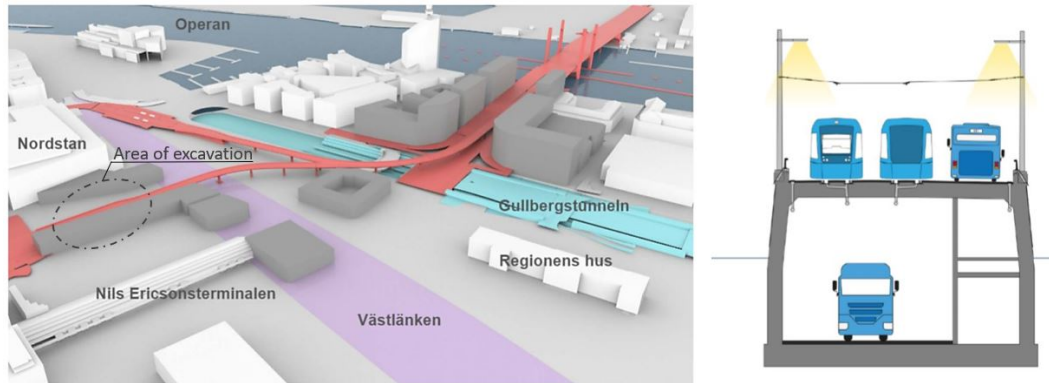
Visualization of location and section of the ramp (Ekholm, 2017) (red=new bridge, grey=future buildings, white=existing).
